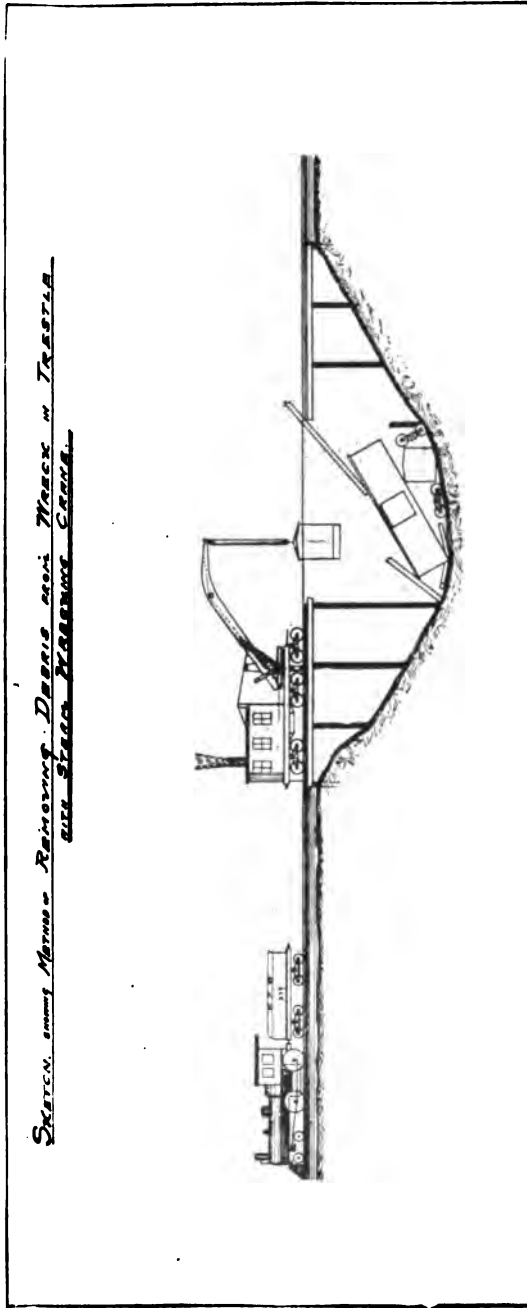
SKETCH SHOWING METHOD OF REMOVING DEBRIS FROM WRECK IN TREESTLE WITH STEAM WRECKING CRANE.
